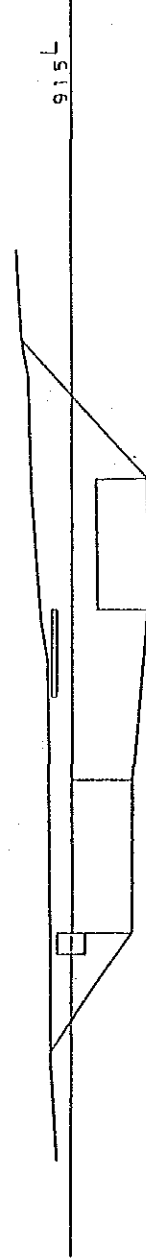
Final Pit Design for No. 4 Shallow Orebody (2)
